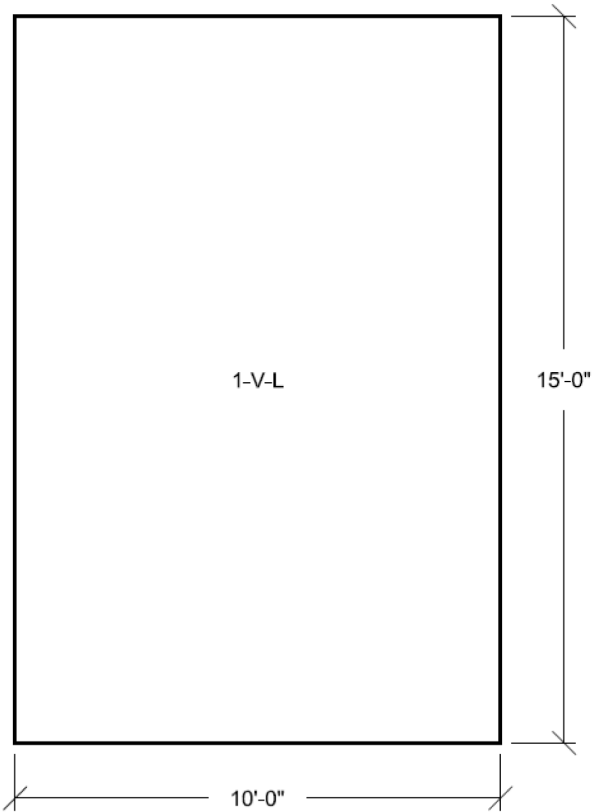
H.6-207 DGFOV Wall 16 Looking From Outside
